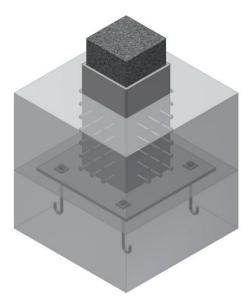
Typical embedded column base for concrete filled steel tubular columns
